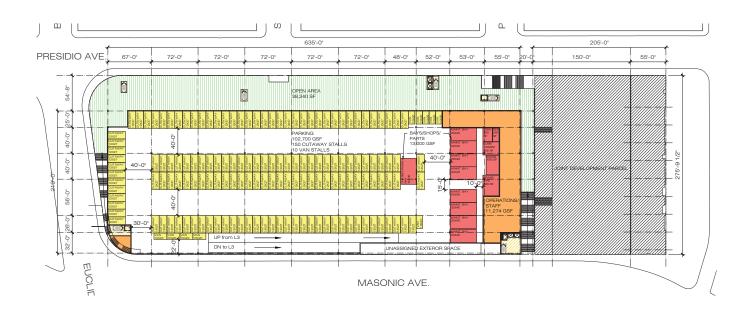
BUS FACILITY CONCEPT DESIGN - THIRD LEVEL PLAN
